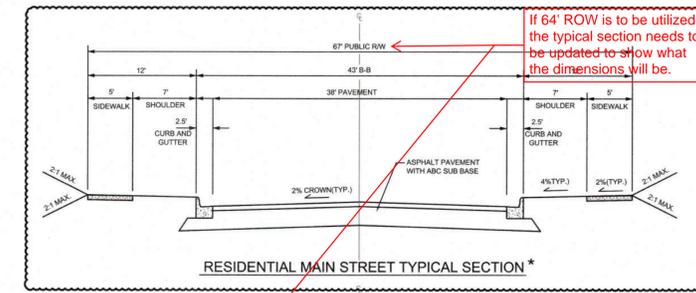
Minor Collector, 2 Lane Undivided Cross-Section\*\*\
